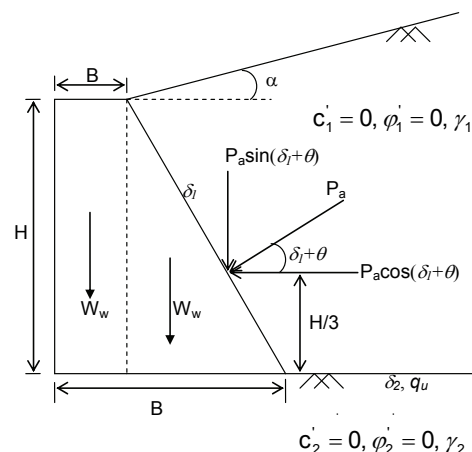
Gravity Retaining Wall with Sloping Backfill
